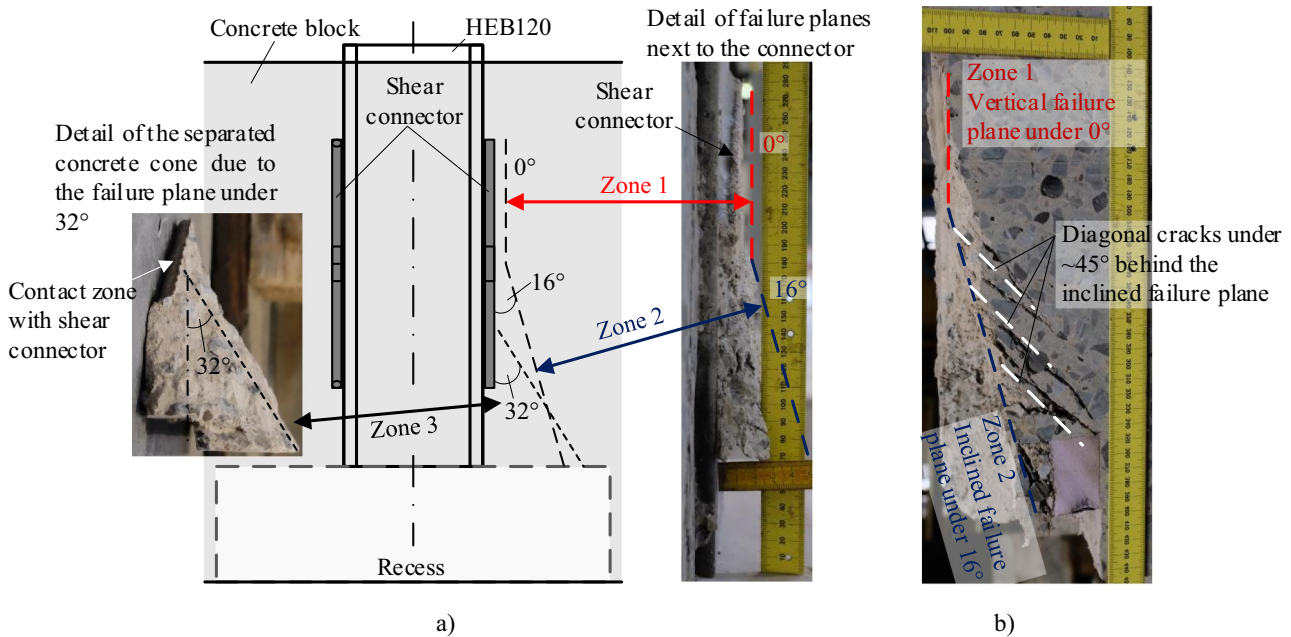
Bv2 failure detail – a) planes at the connector and b) planes in the concrete (cut reference: line (c) in Fig. 10).
